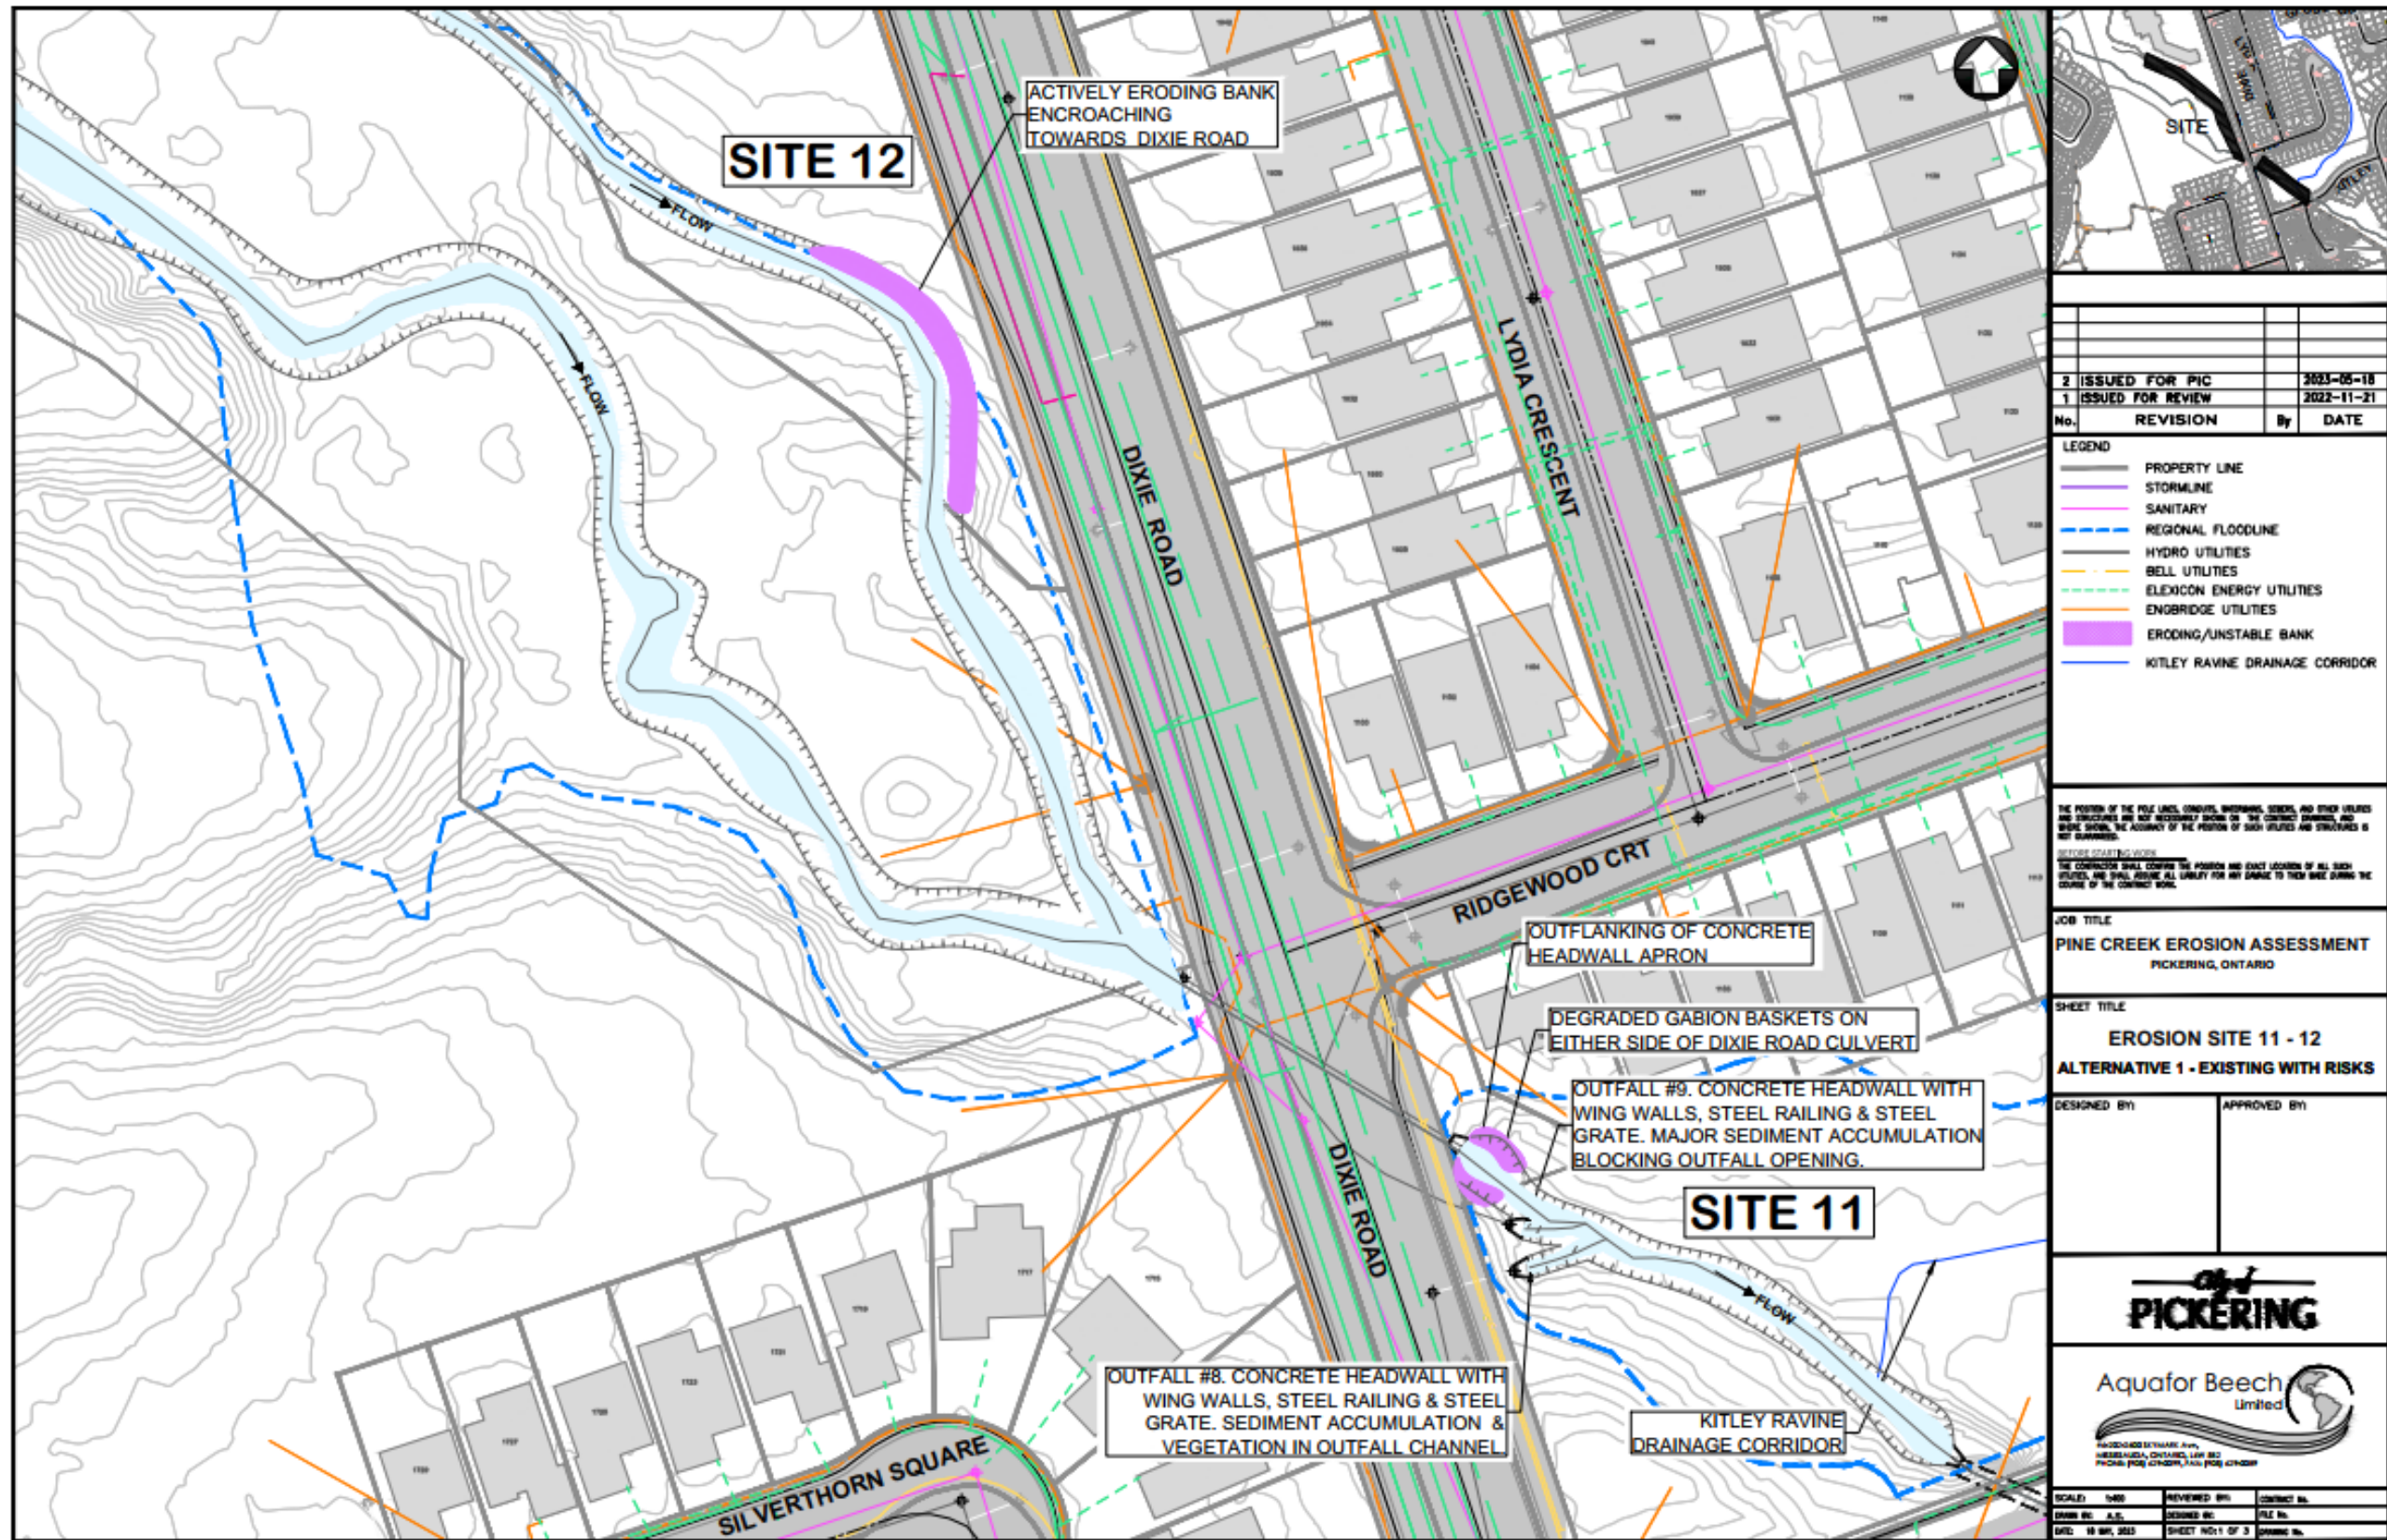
Erosion Site #11-12: Existing Site Conditions
